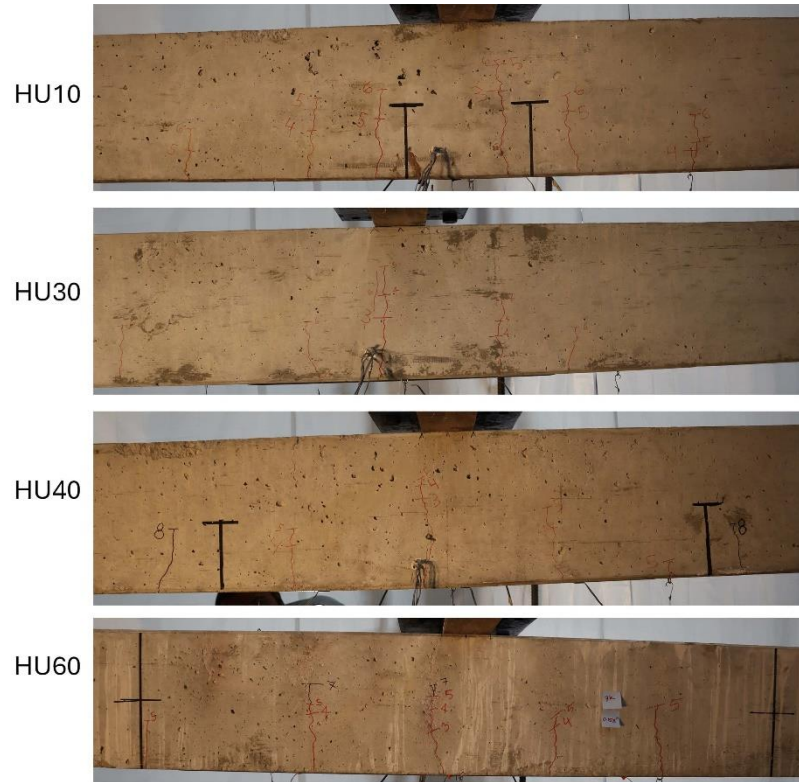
Cracking condition of specimens at yielding of the tension reinforcement steel
